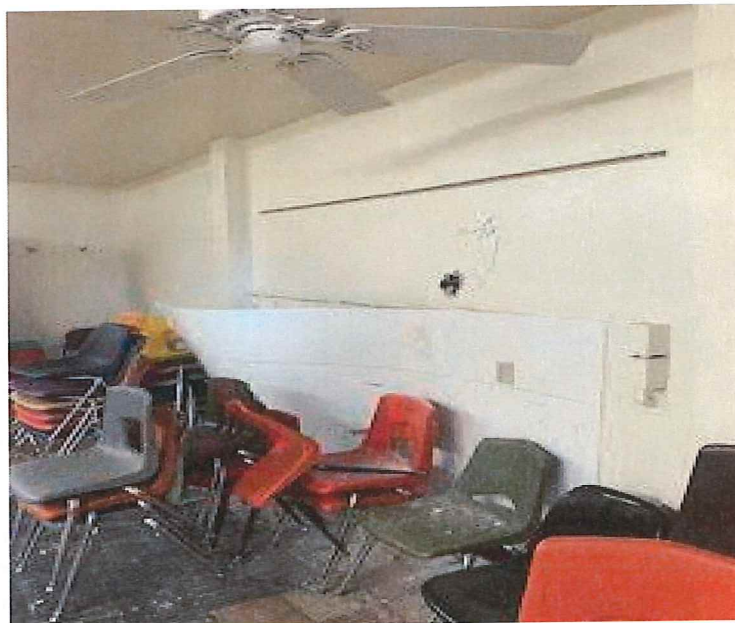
A view of the light brown 9'x9' tiles in the 2<sup>nd</sup> floor center room.
